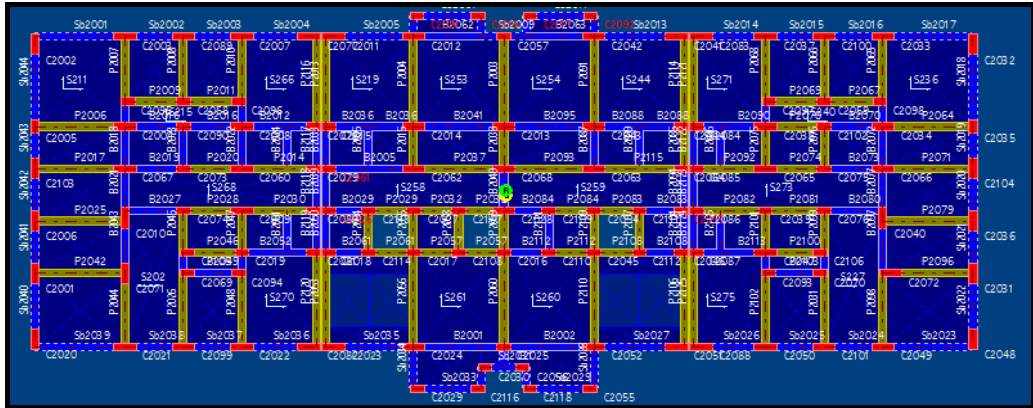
Plan of Twenty Eight Stories and Tunnel Formwork System
